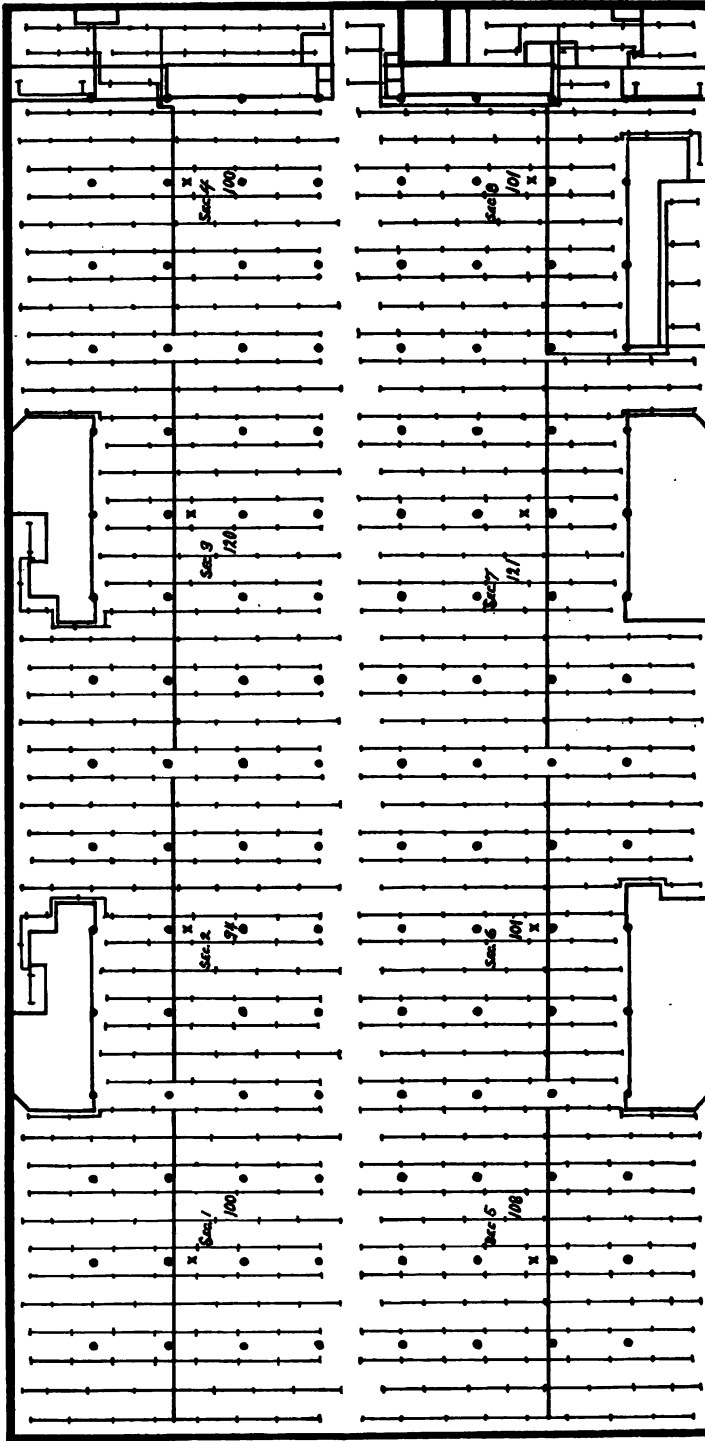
THE RISERS WHICH FEED EACH SECTION ARE INDICATED AT X IN THE PLAN.
